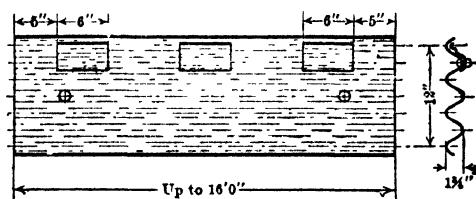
Wemlinger Corrugated Steel Sheet Piling
